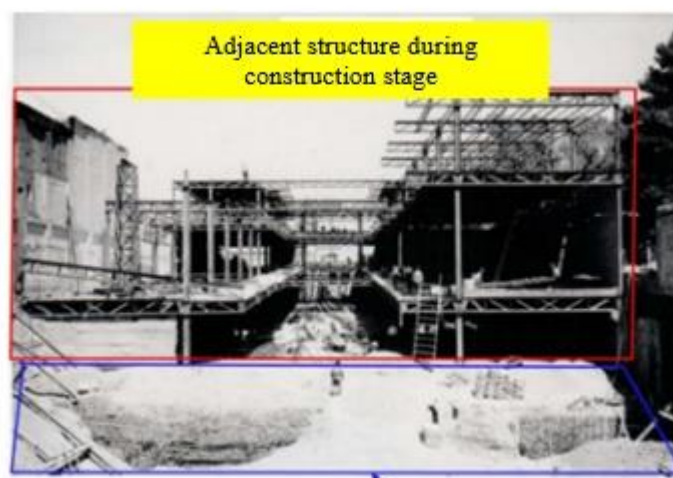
Photo of the 5-floor adjacent structure during the construction phase (Govt. of Iran (2017))
